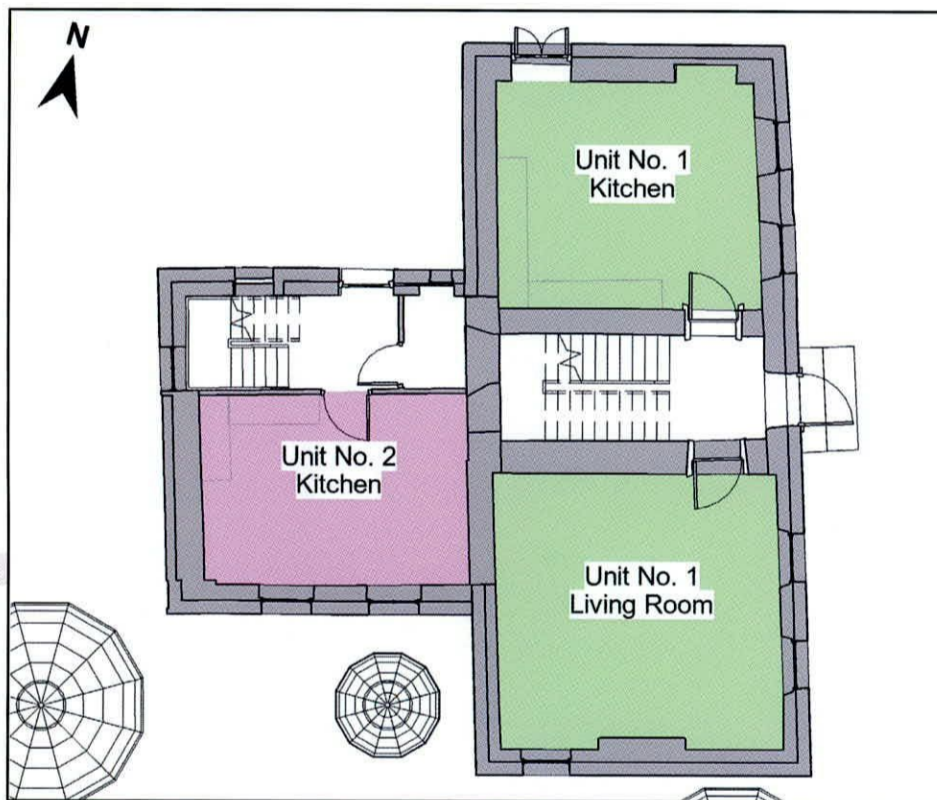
Floor plan of assessed building, Keyplan highlighting the assessed building (L).
